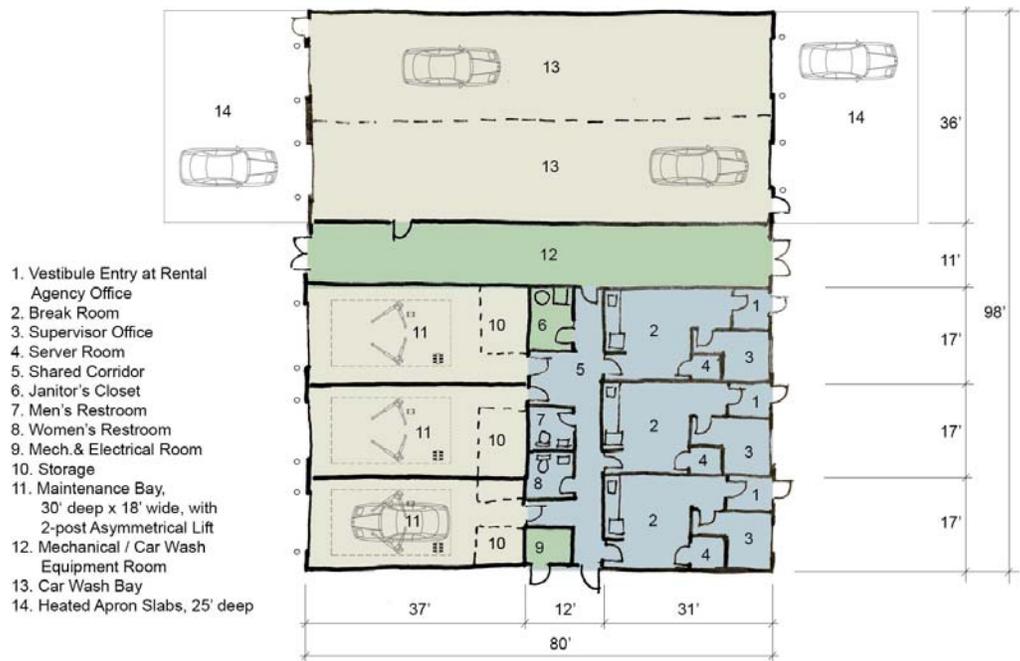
Conceptual Floor Plan for Multi-Purpose Building
